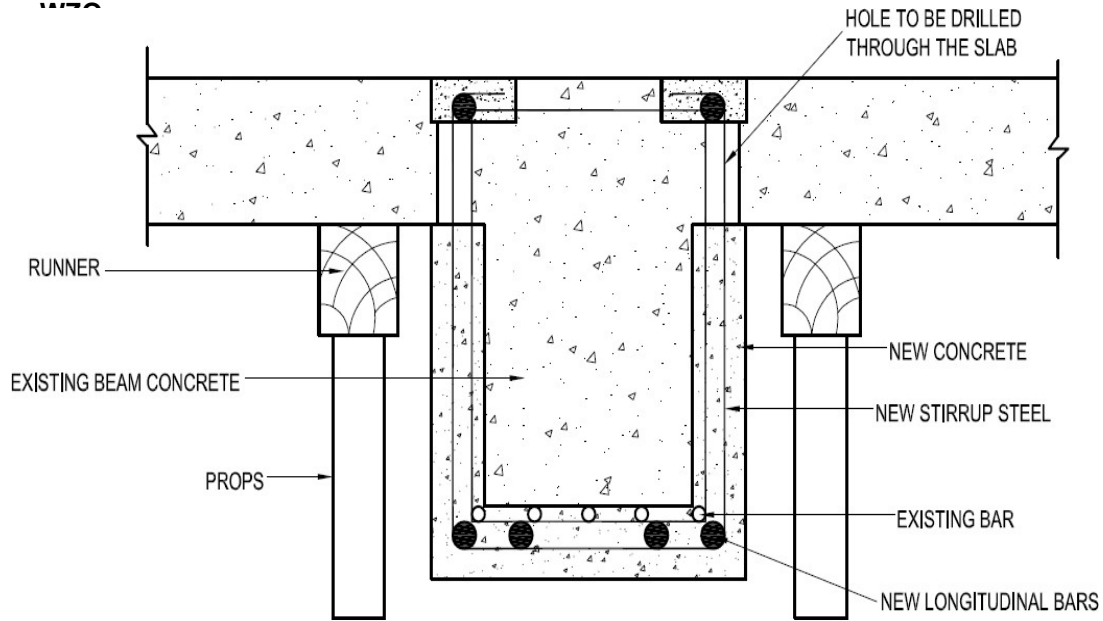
Typical Strengthening of Beam and propping of slabs with a runner on sides of the beam
